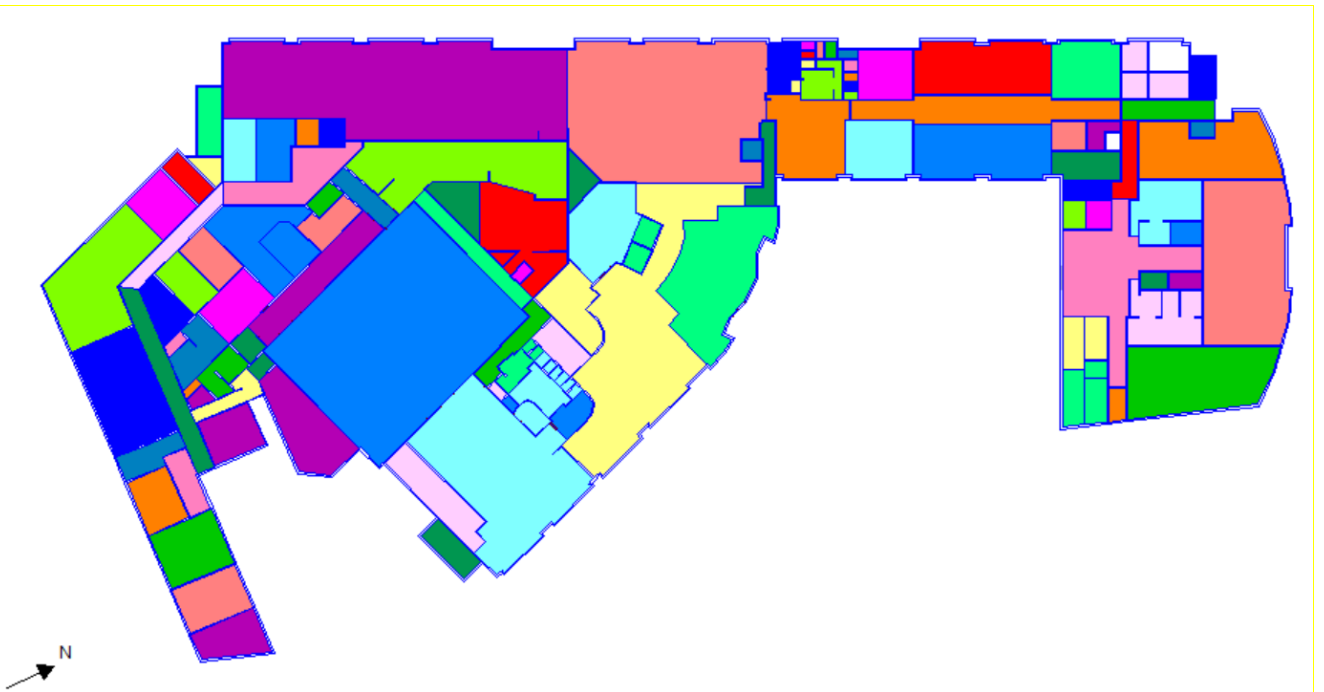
Typical floor plan showing floor usage and allocation of zones (Hilton Reading)
